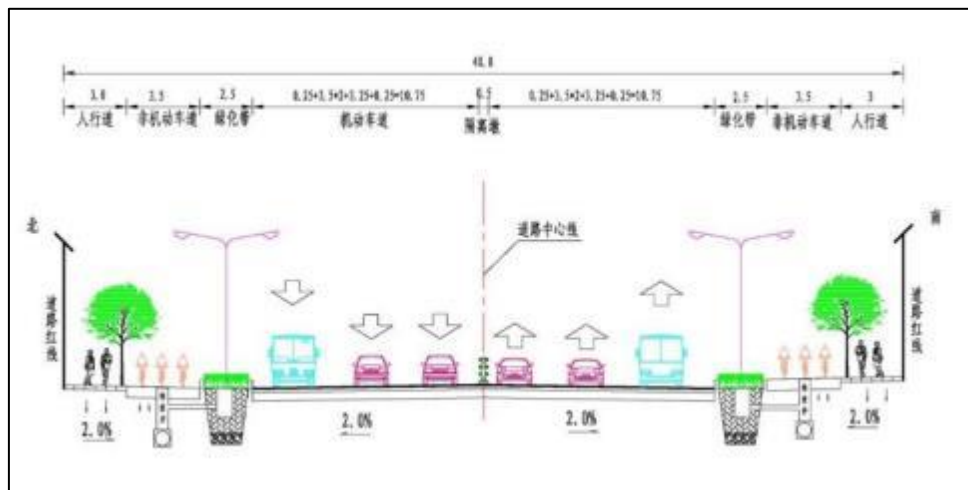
Cross Section of Binhe Road (North Avenue-Jiangjun West Road)
